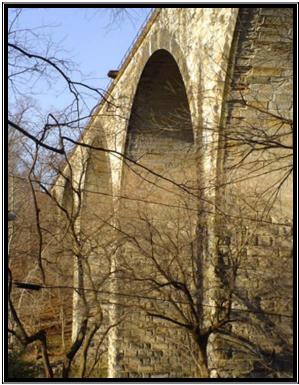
Looking west from existing rail trail toward railroad bridge over Brandywine Creek
